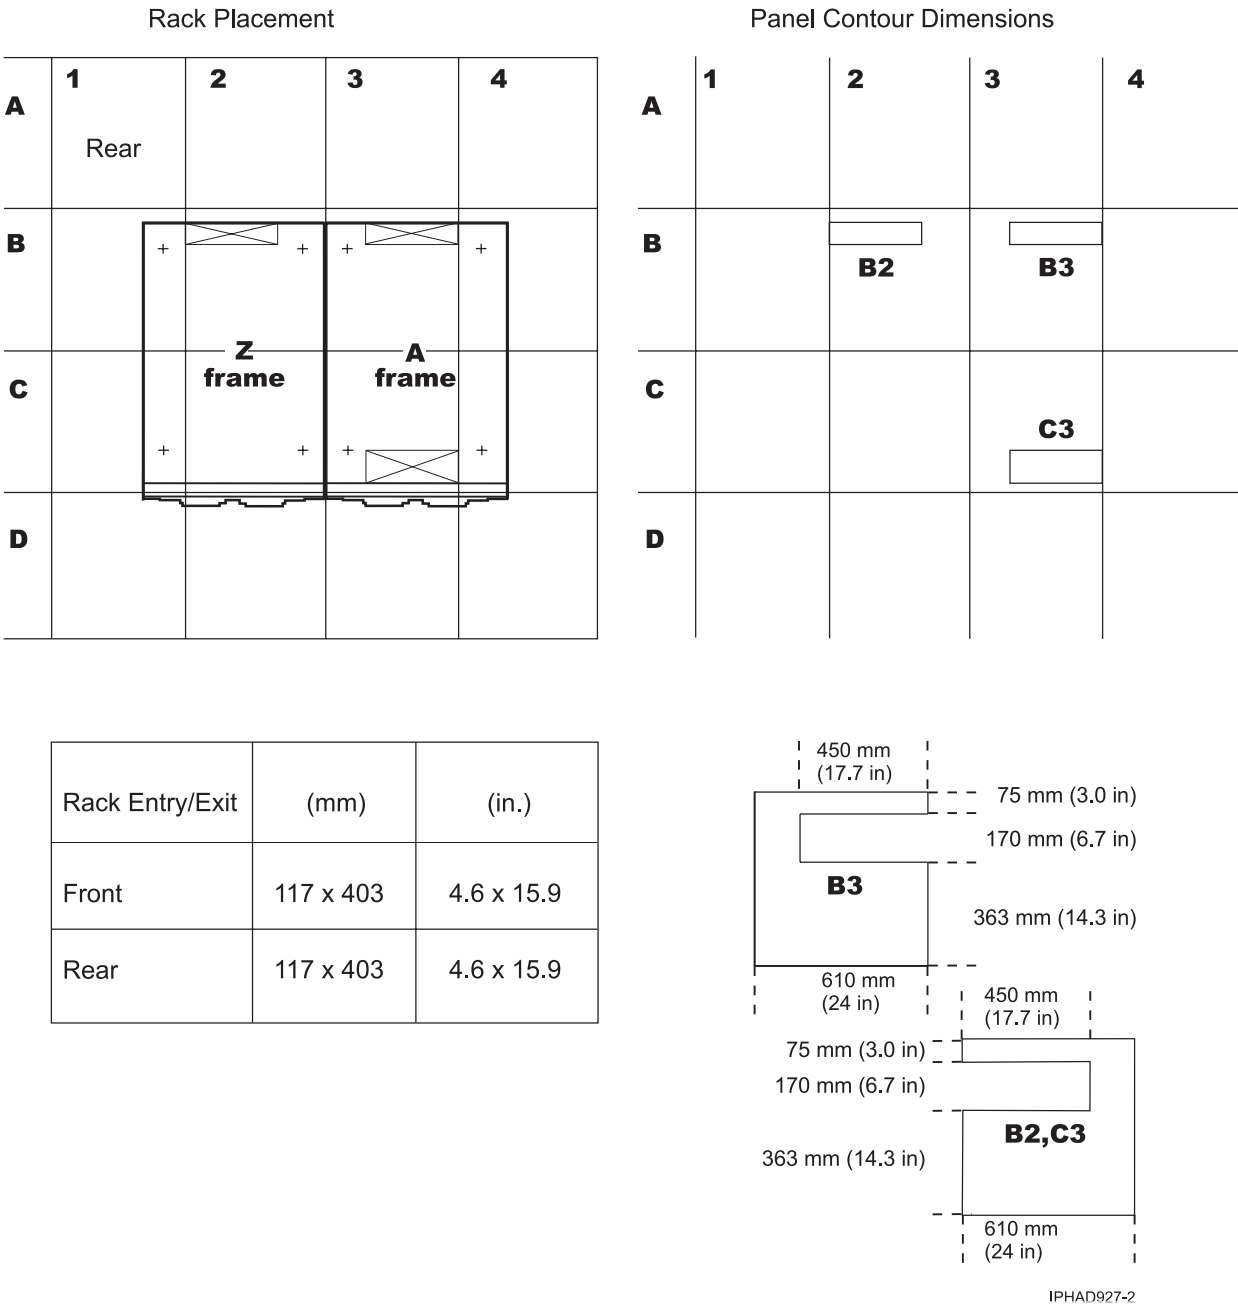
Raised floor with 610 mm (24 in.) floor panels figure
